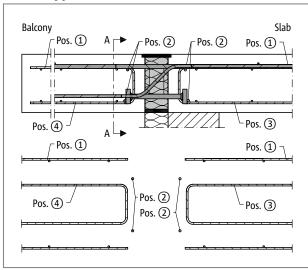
Schöck Isokorb® T type K-M12: On-site reinforcement with direct support
